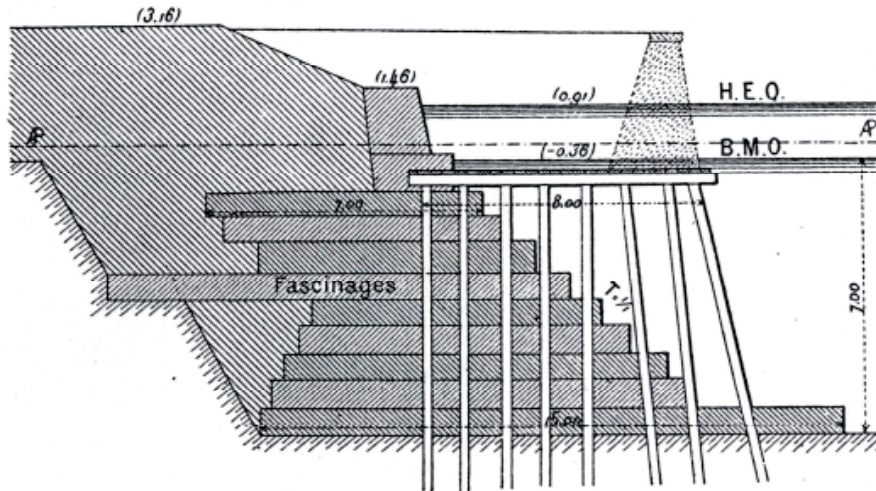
Quay wall structure, Rotterdam 1870 [Rochemont and Desprez [1900]
